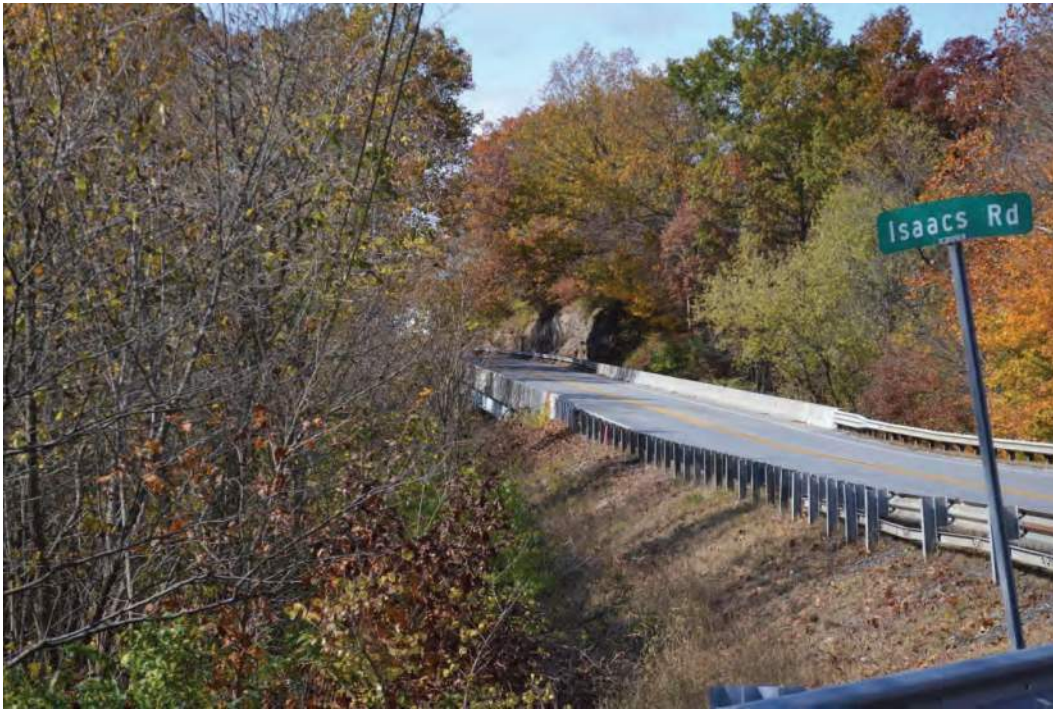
View along US Highway 50 from Isaacs Road, facing west
